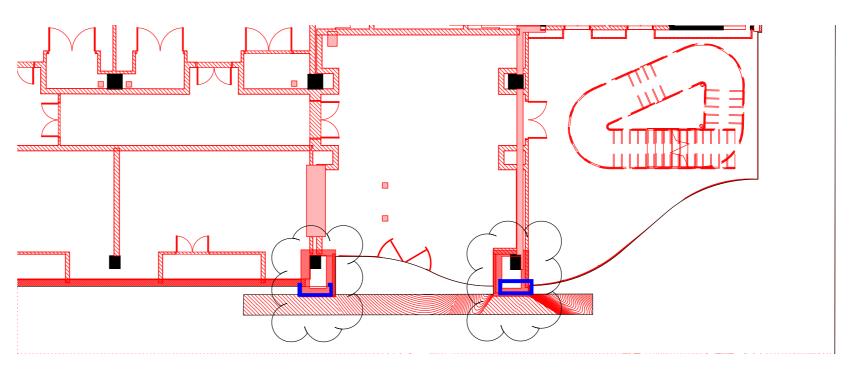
Proposed Amendments - Consented Ground Floor Plan Demolition
